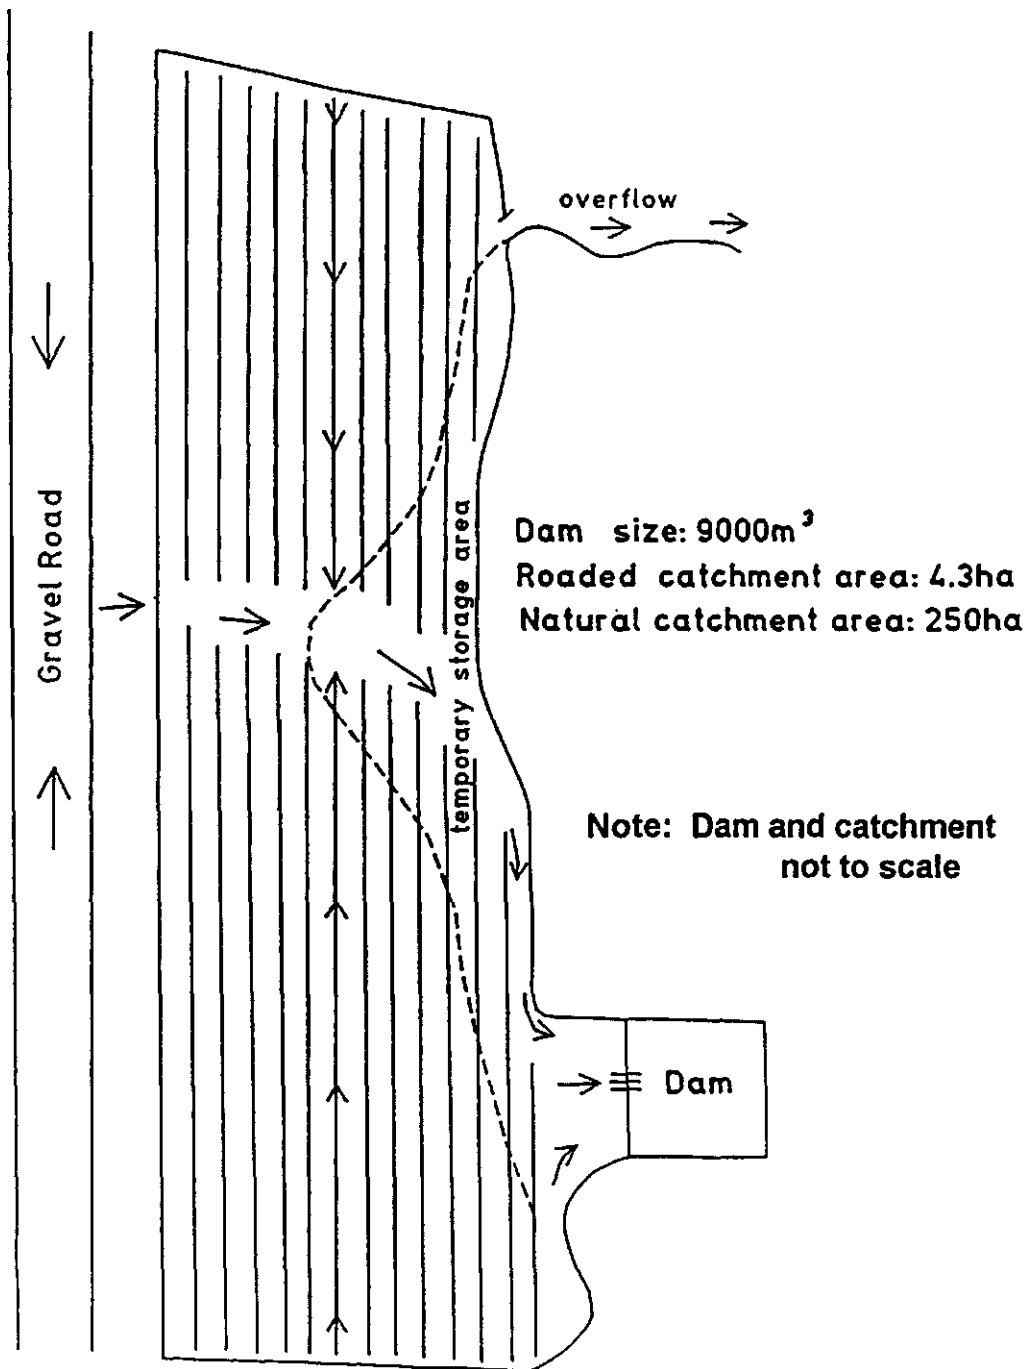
Plan review of a dam and roaded catchment design (Farm 1).
